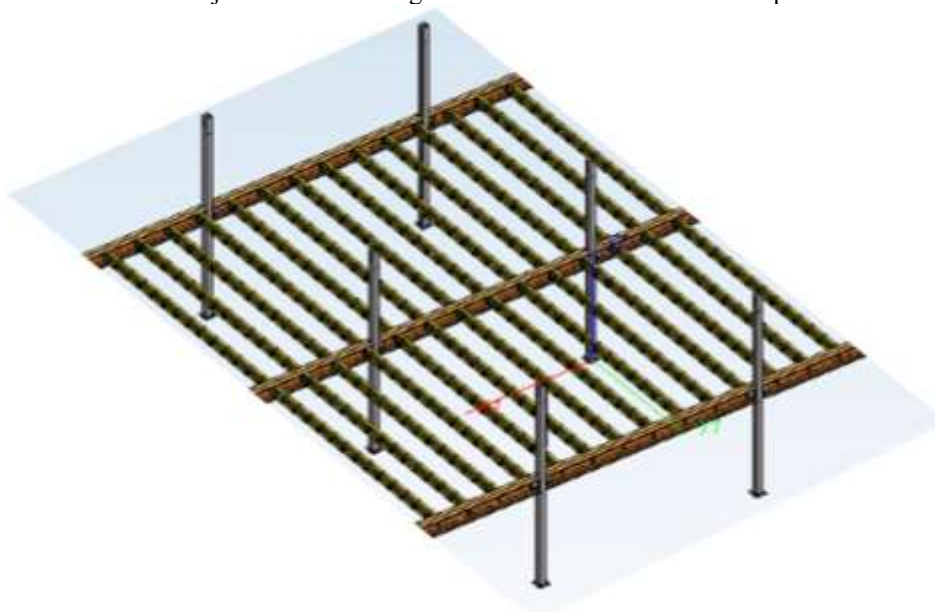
General view of the beam supporting structure of one of the warehouse levels
